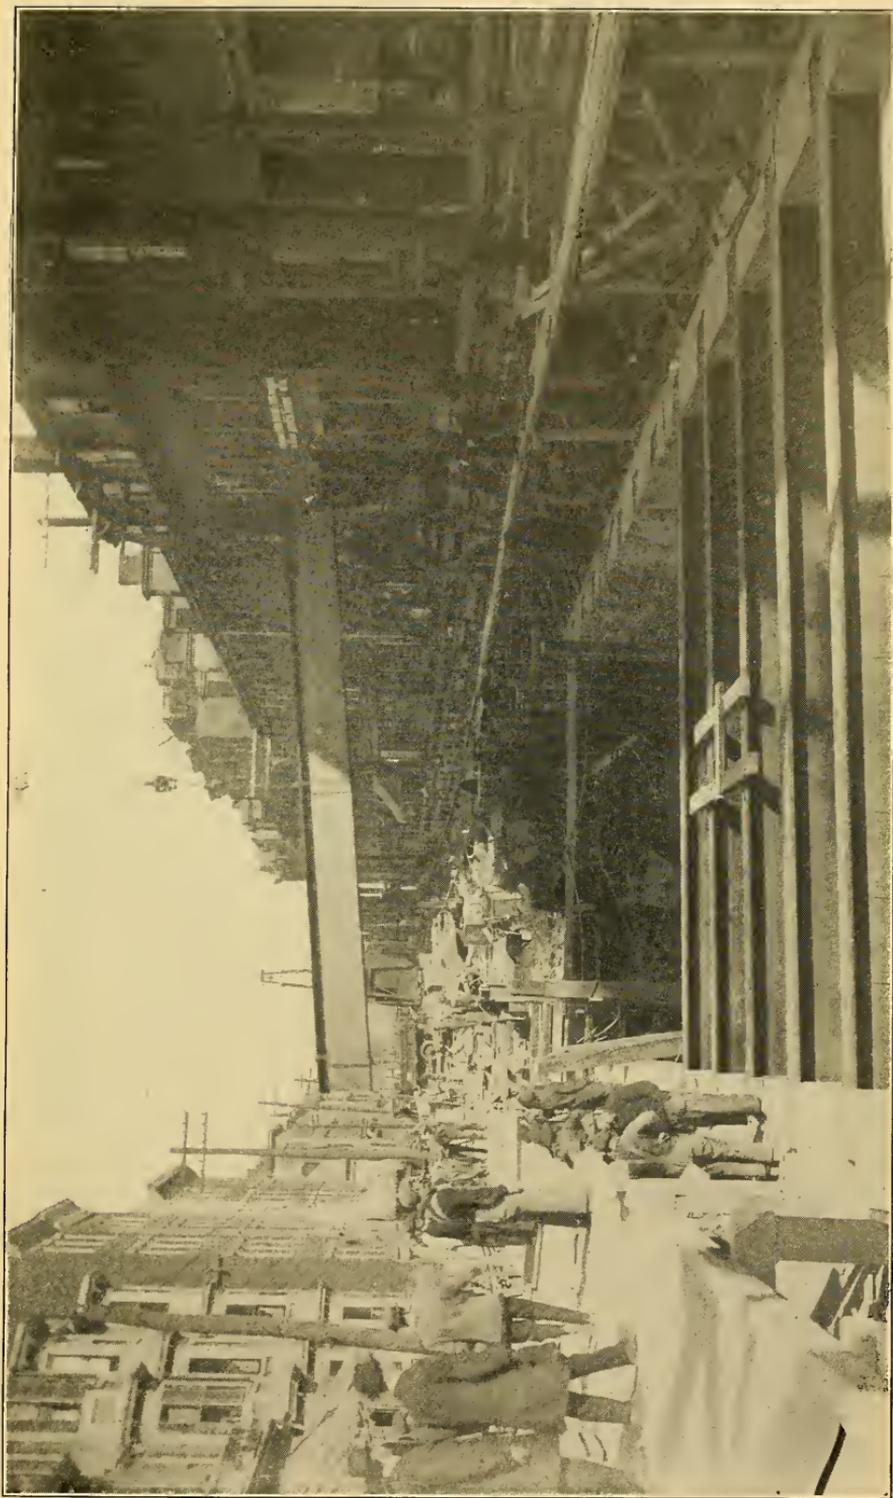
PLACING ROOF BEAMS OF SUBWAY — CHELSEA STREET
